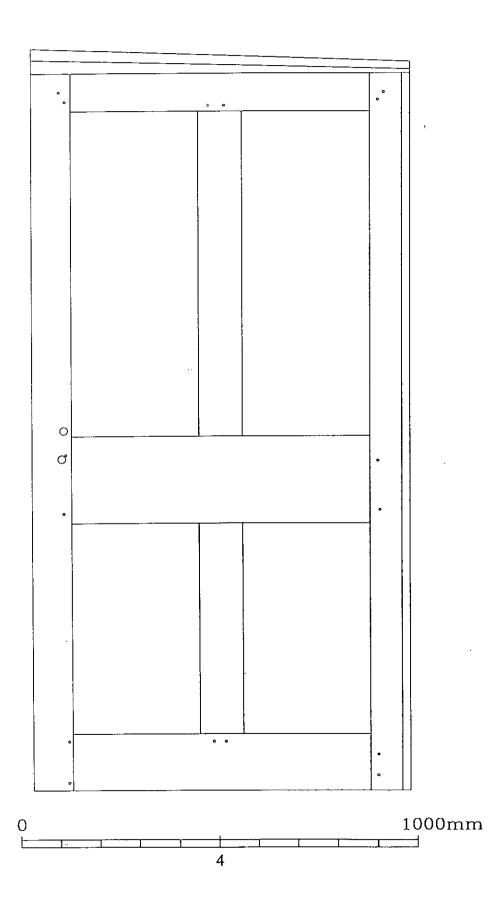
Elevation of the north side of the baize door, showing in schematic form the distribution of nail holes relating to the fixing of the baize
